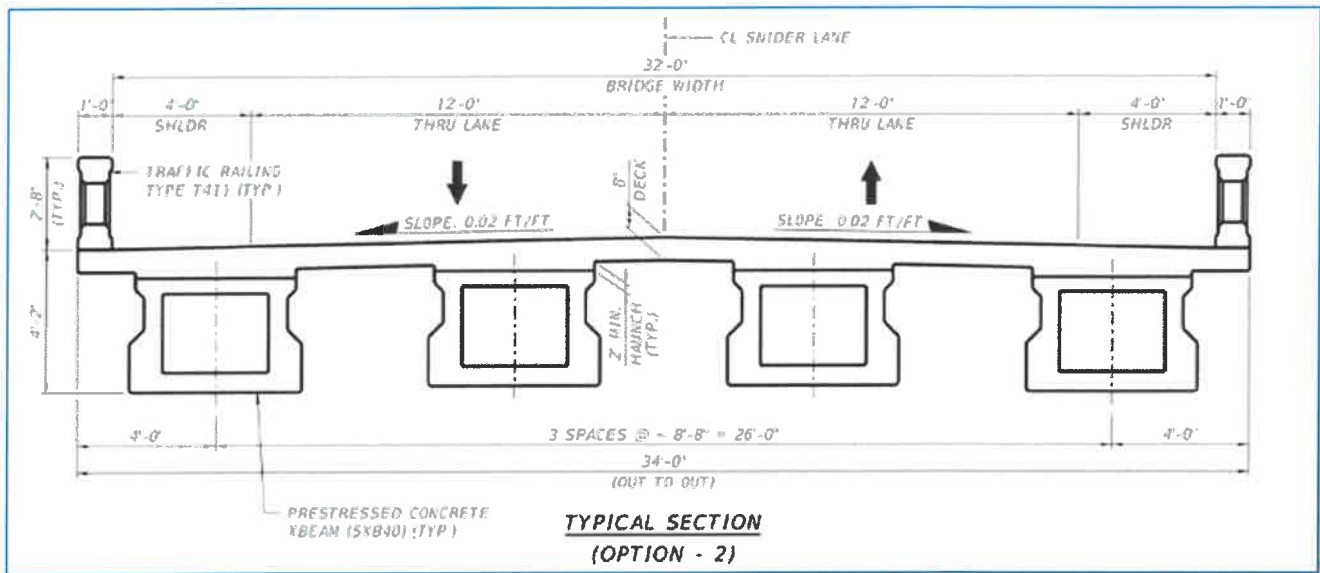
TxDOT Prestressed Concrete XBeams (5XB40) Typical Section
